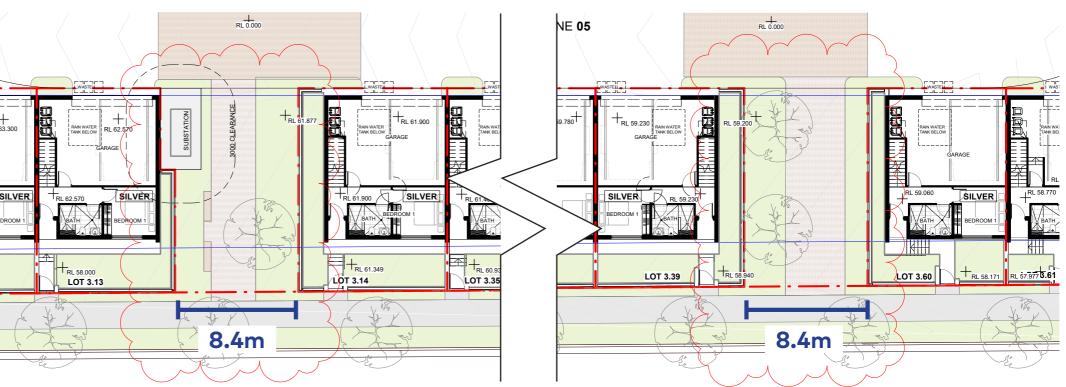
Ground Floor Amended Pedestrian Link Buchan Ave
